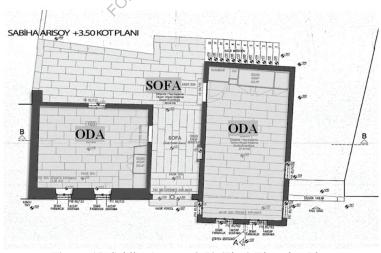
Sabiha Arısoy +3.50 (First) Elevation Plan
